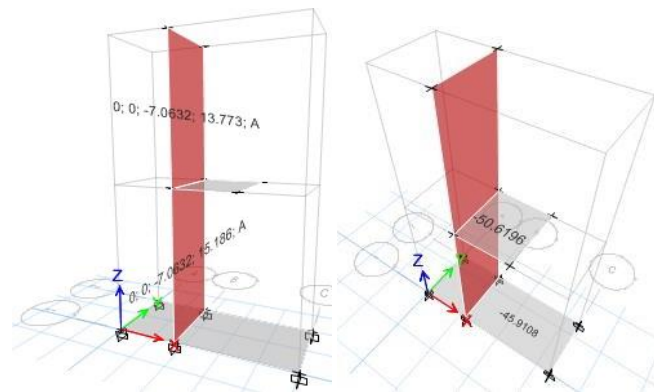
Model of retaining wall with relief shelf with load acting on its stem and heel portion.
